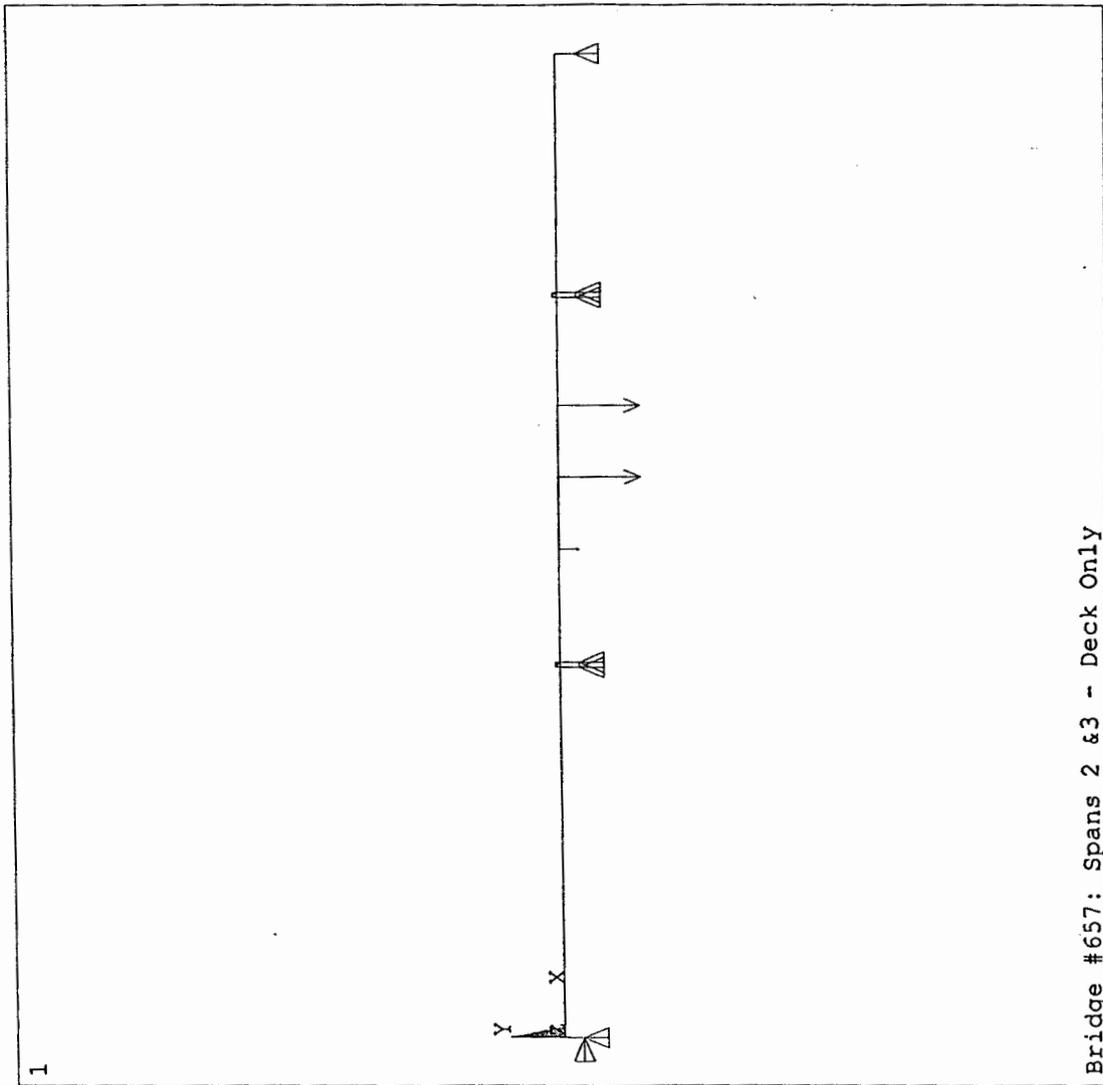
Bridge #657: Spans 2 and 3 - Model Plot
